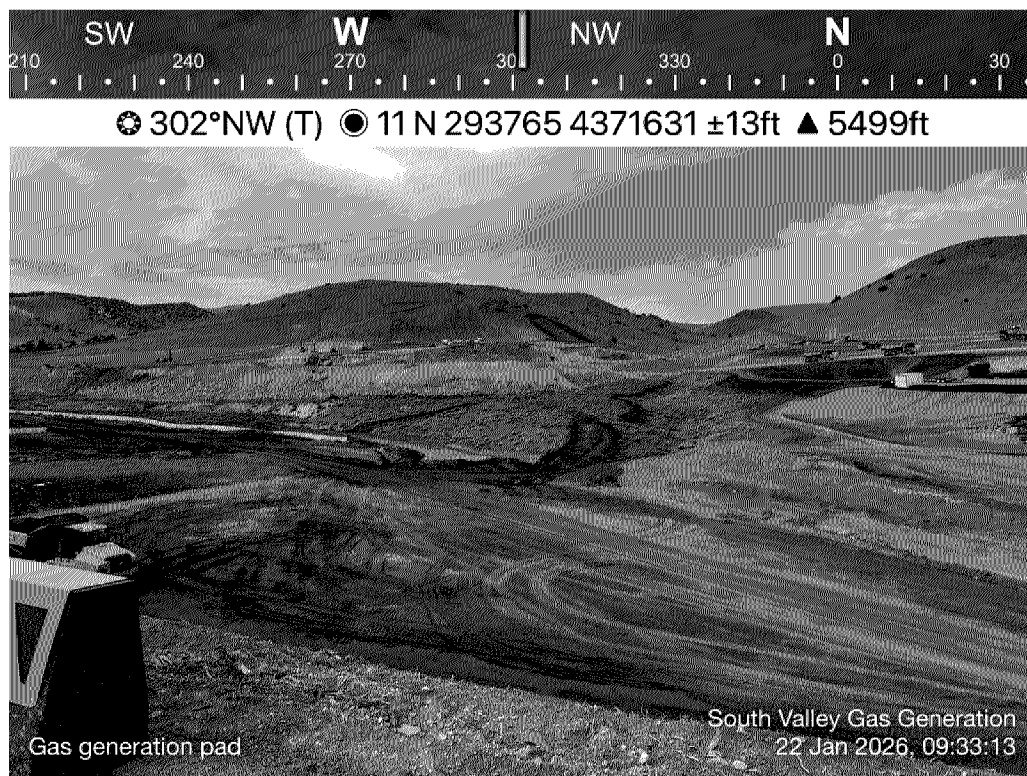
View from private access road (Fleet Street) facing northwest towards the proposed South Valley Gas Generation site and associated data center development area.
